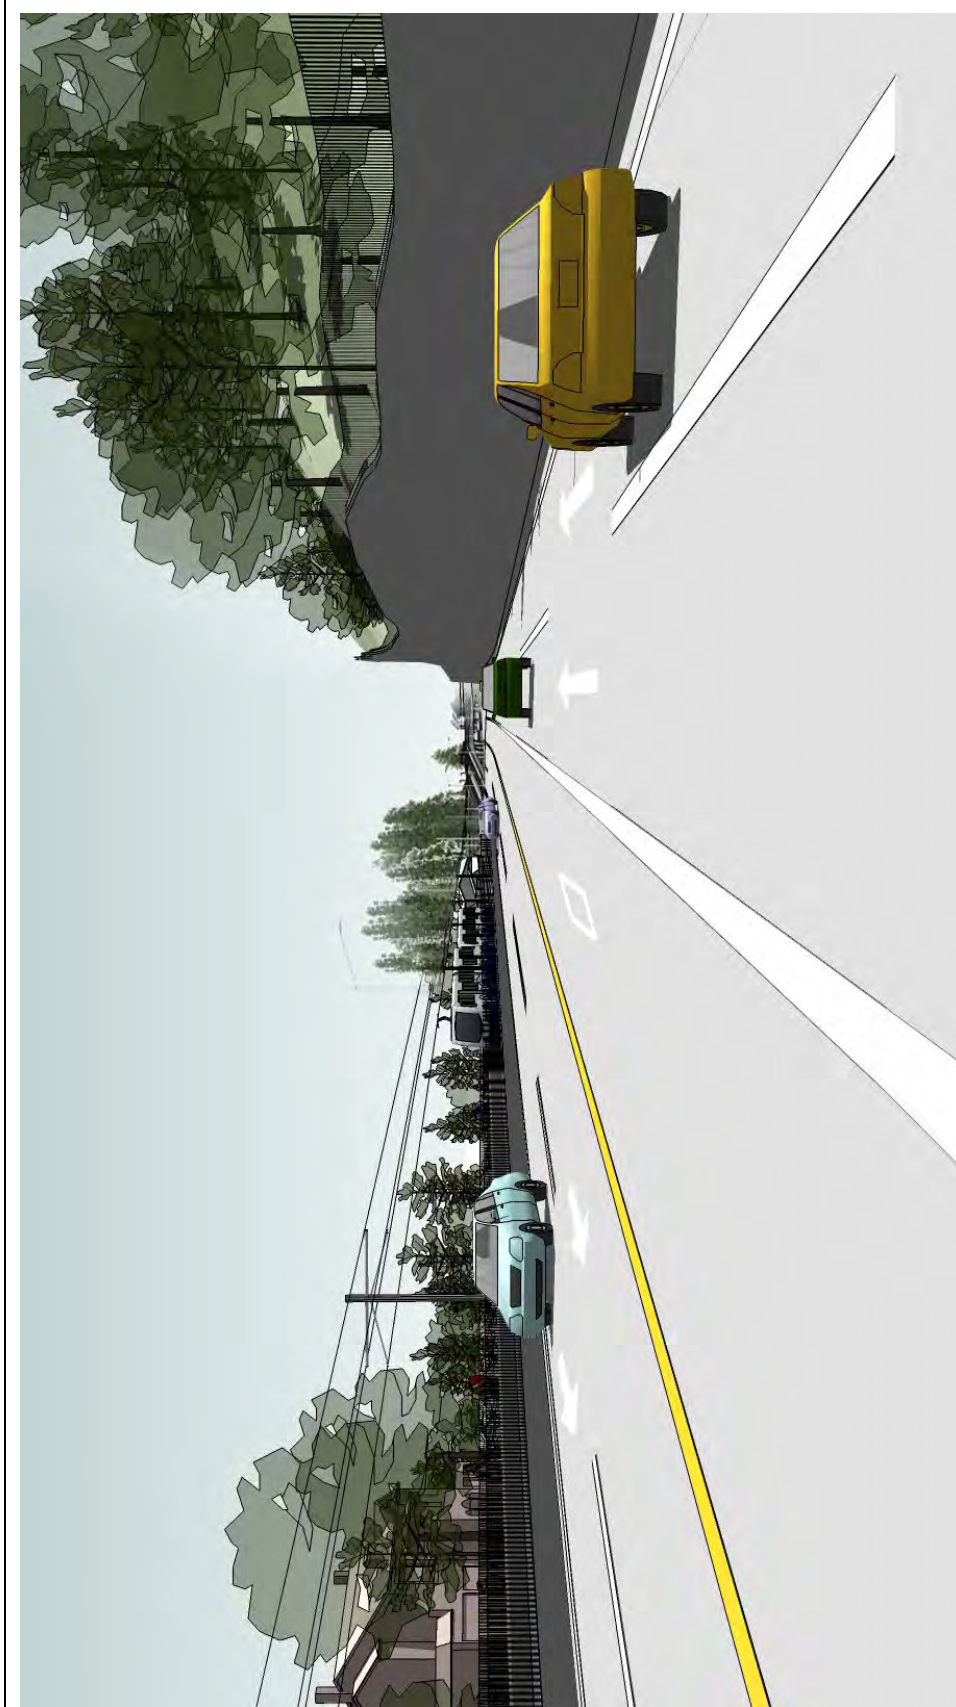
6: Bellevue Way Alignment at Winters House - Shift Bellevue Way West with City of Bellevue HOV Lane – Looking South (Street view) at Winters House – Cost Savings Idea 1a
